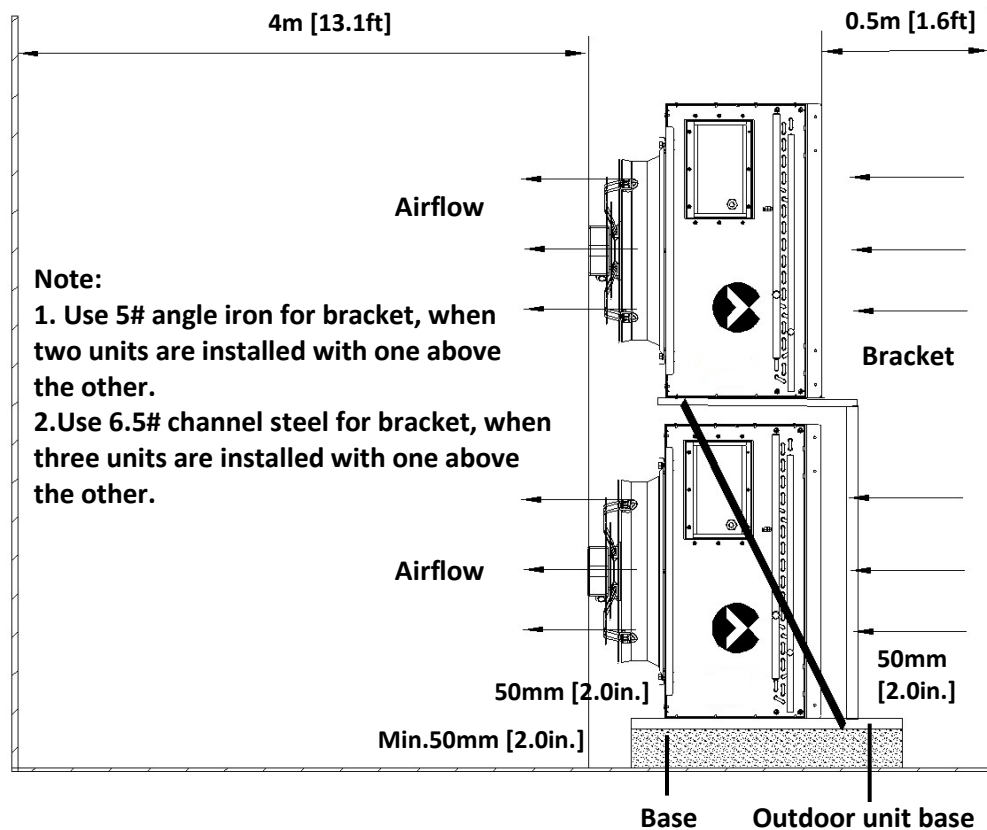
Multiple Outdoor Units Placed in Overlap Mode
